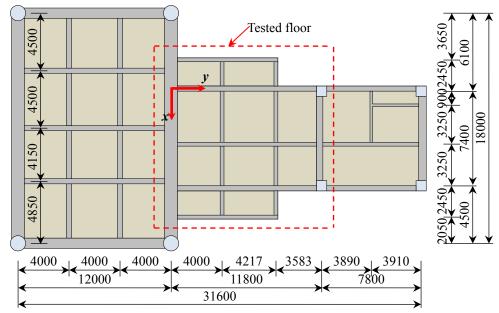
Outline of prestressed concrete floor #2 (all dimensions in mm)
